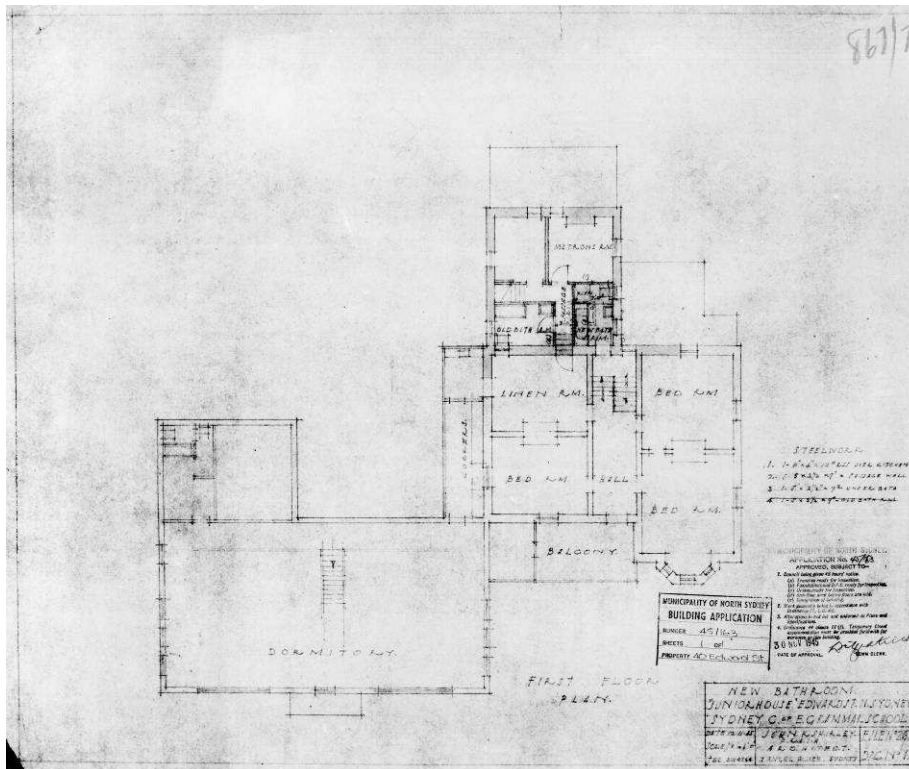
Plan of alterations and additions to Upton Grange undertaken in 1945 and also showing the early layout of the first floor.
